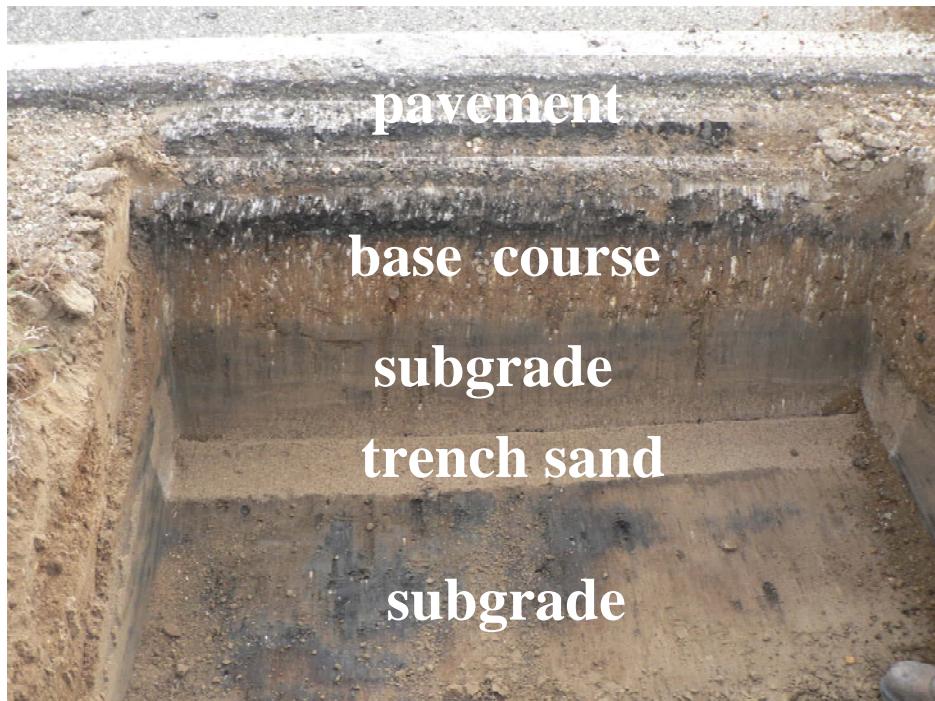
Illustration showing the excavated pit down to the level just above the edgedrain elevation
